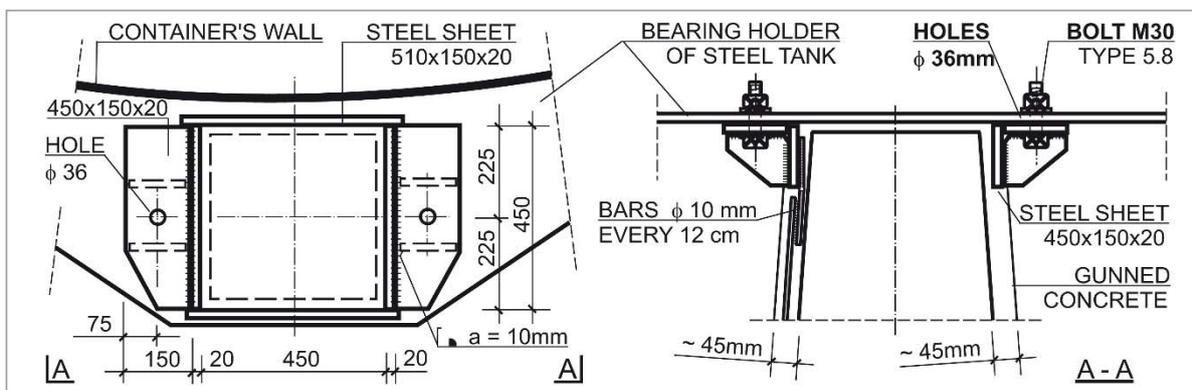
Stabilization concept of the support structure's head of the 600 m³ gas tank
